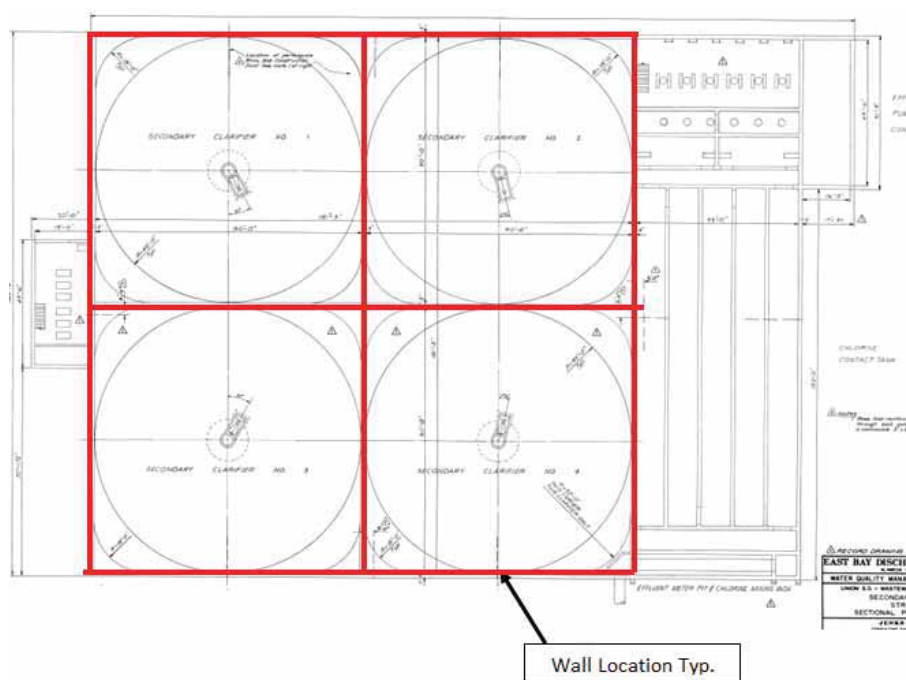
Secondary Clarifiers 1-4 Concrete Wall Locations
